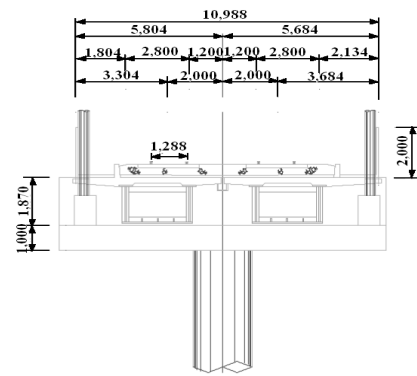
Structural configuration of the elevated bridge on #1 region (unit : mm)
